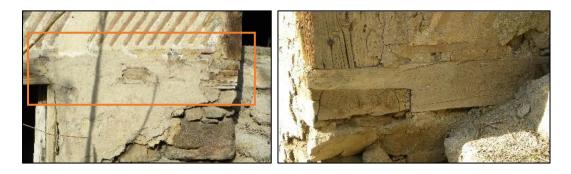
Connection detail 2, connection of timber foot plates by half lap joints and nails, (Demirci N. b.block-lot:448-2)
